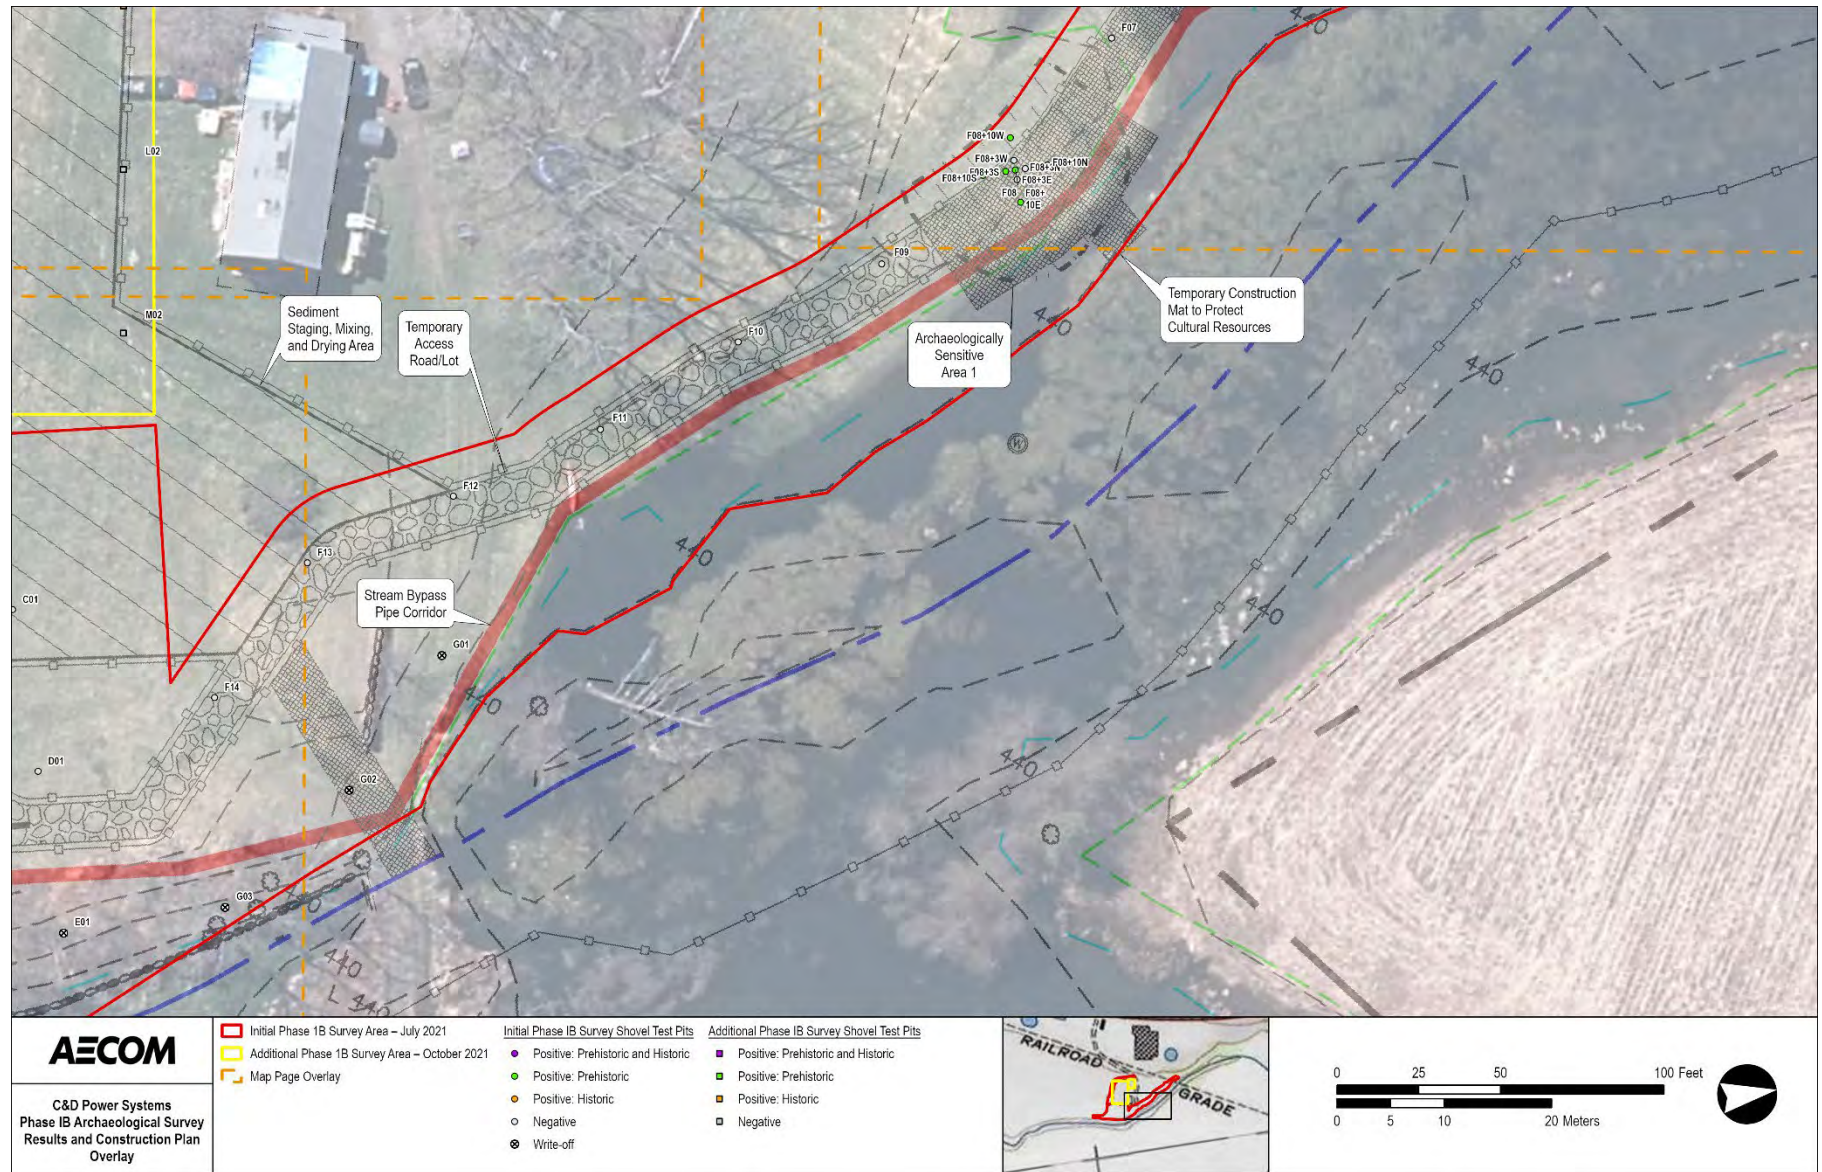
Phase IB Survey Results and Construction Plan Northeast
